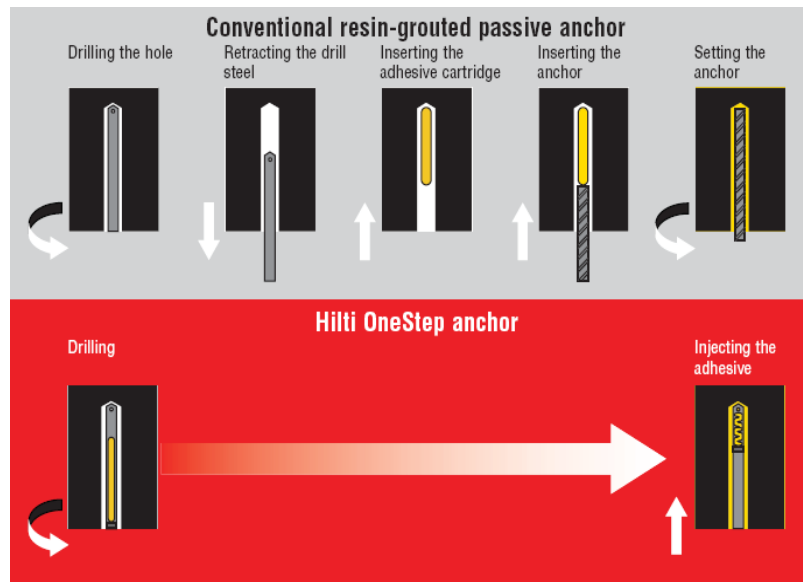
Comparison of bolt installation steps between conventional resin anchor and Hilti OneStep rock anchor [39]
